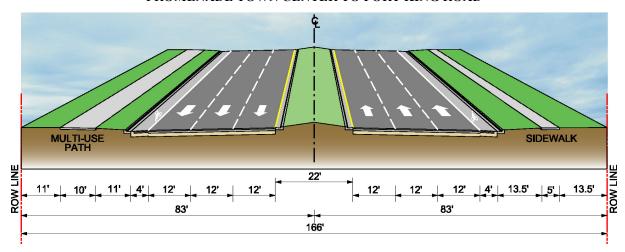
SIX-LANE DIVIDED URBAN TYPICAL SECTION FORT KING ROAD TO US 301
